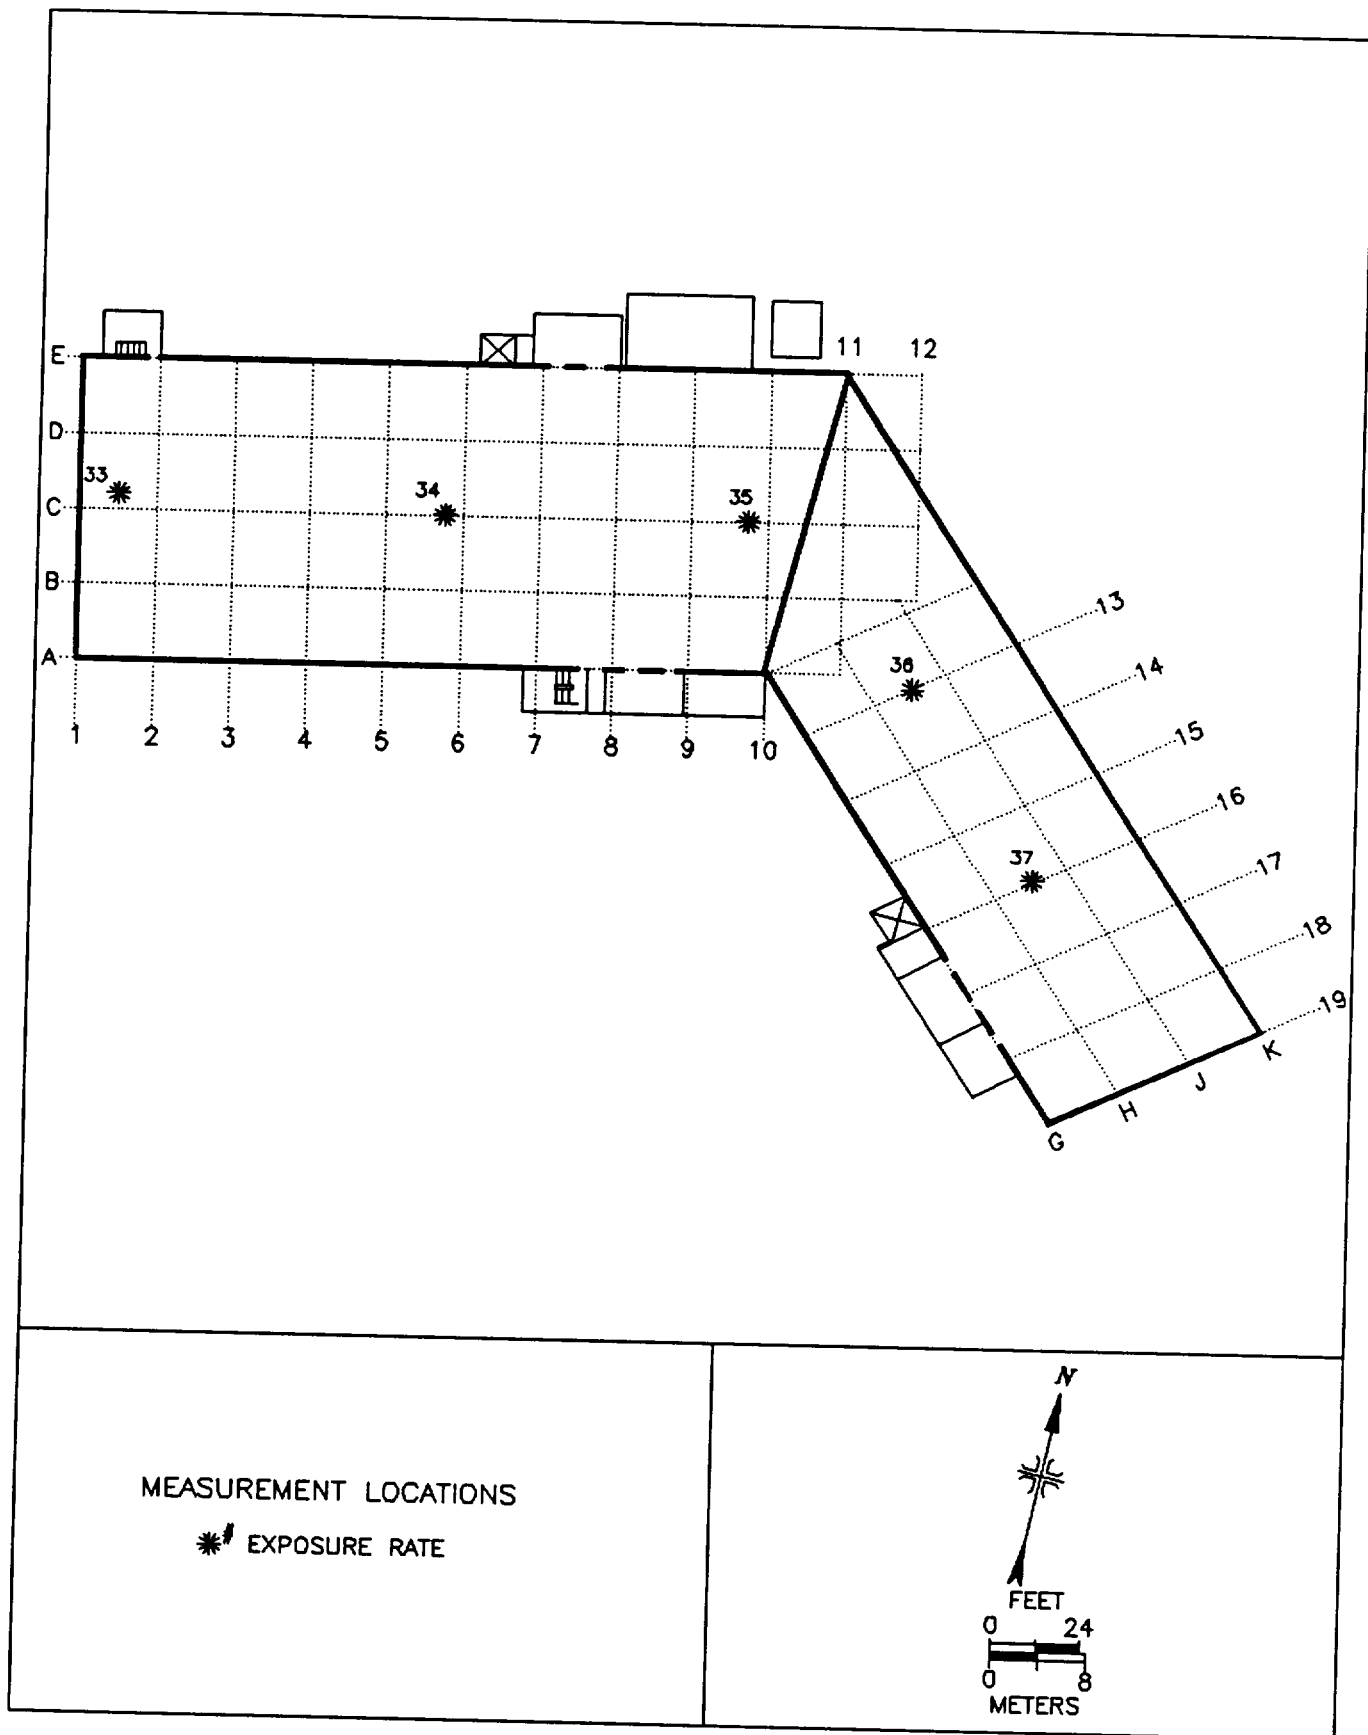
Building 8, First Floor – Exposure Rate Measurement Locations
